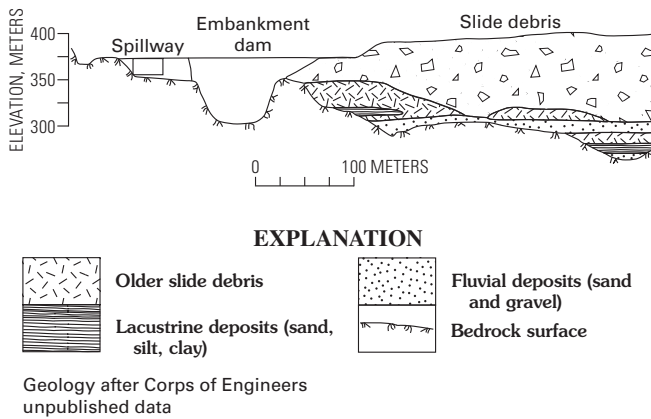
Cross section through the site of Howard Hanson Dam in western Washington State, United States, showing the huge landslide that serves as the right abutment of the dam. Modified from Galster (1989a).
